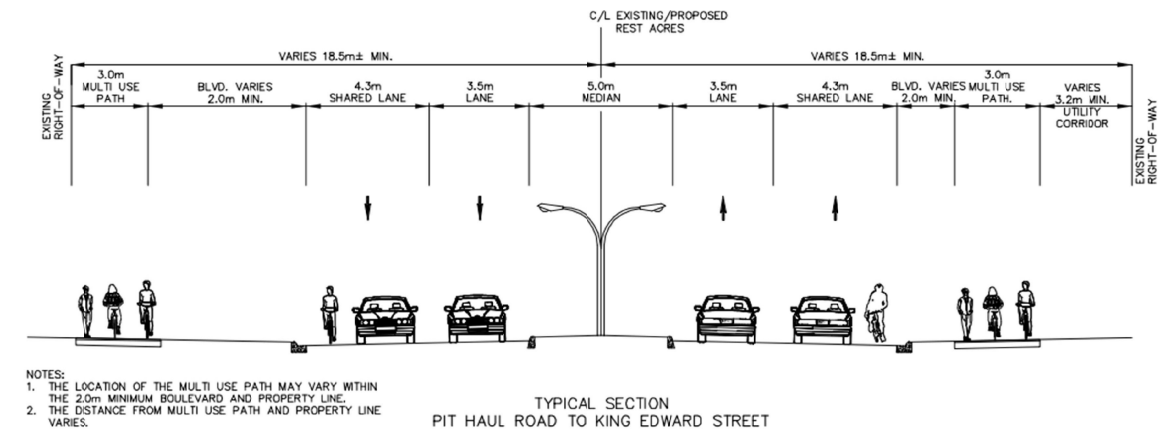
Recommended 4-lane Cross-section on Rest Acres Road
